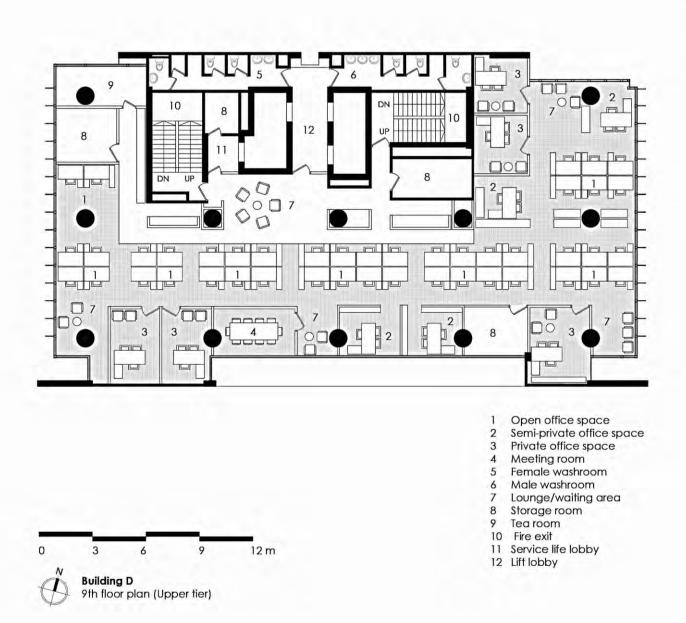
Floor plan of Building D: Upper tier (Source: Building D management, edited by author)
